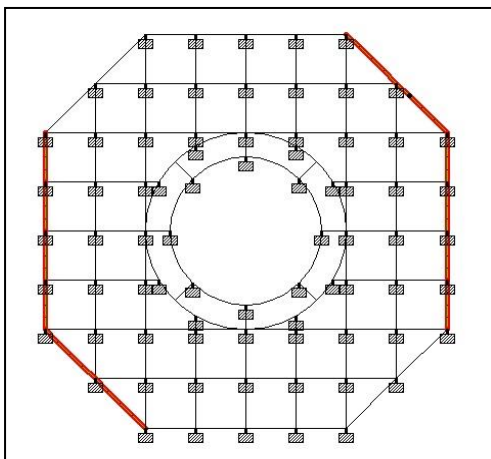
(e). Model 5- building with shear wall on opposite two adjacent edges.
